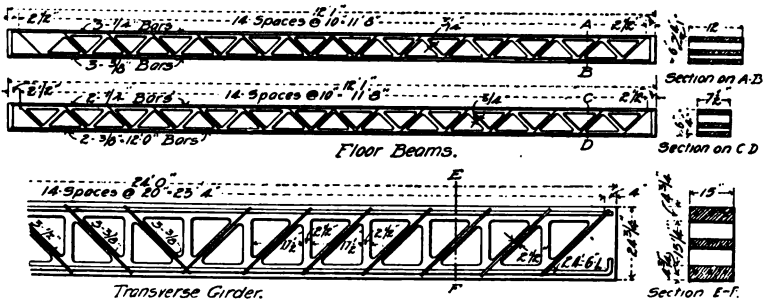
Visintini Beams and Girders, Textile Machine Works Factory.
